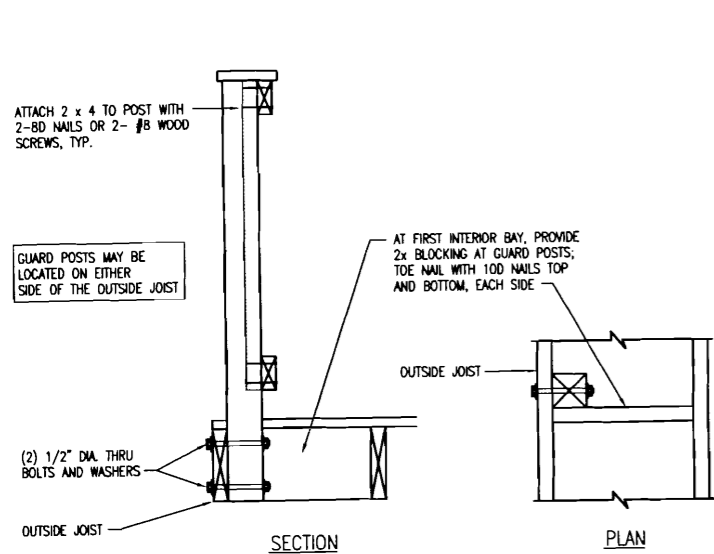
GUARD POST TO OUTSIDE JOIST DETAIL
